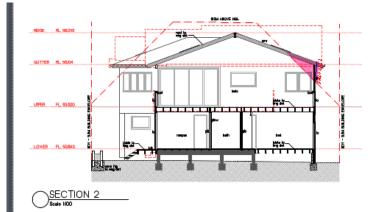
Northern elevations building envelope breach (indicated in purple)
